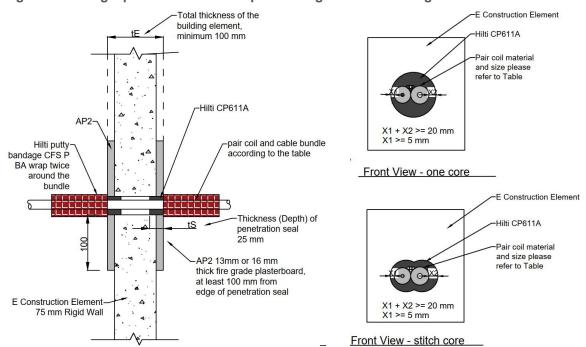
Single pair coil and cables penetrating 75 mm thick rigid wall with plasterboard build-up
